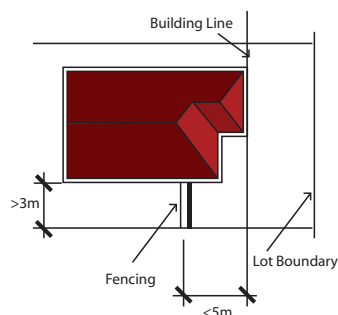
Return fencing permitted to be constructed from pre-painted sheet steel
